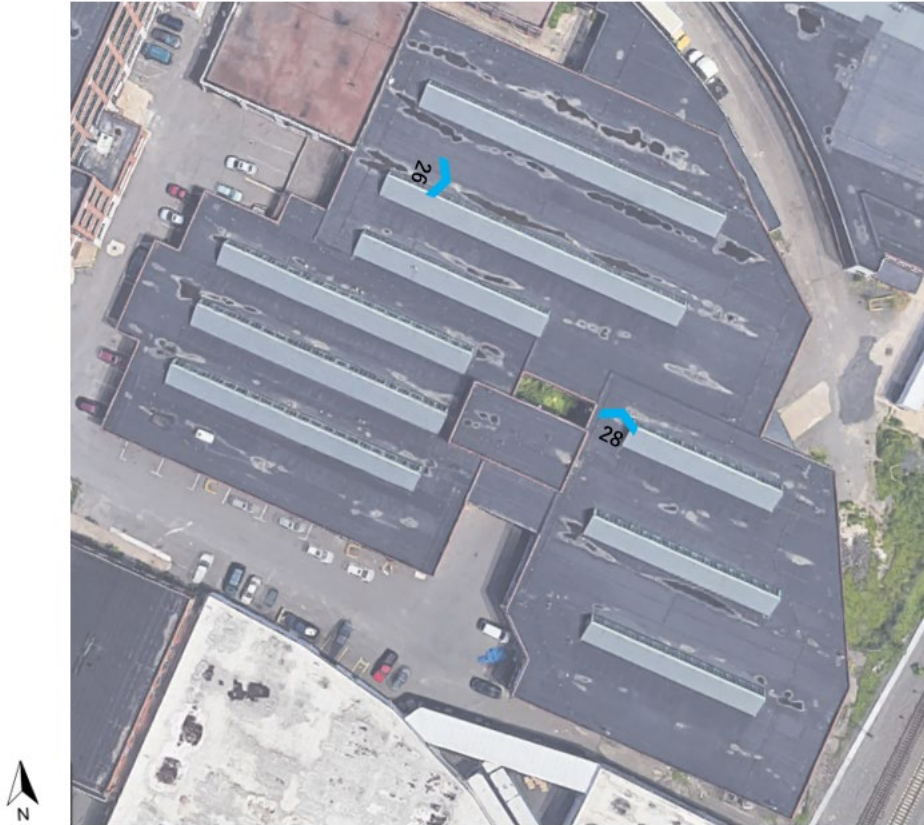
Photo Key Plan – Factory/Warehouse Building – Interior
